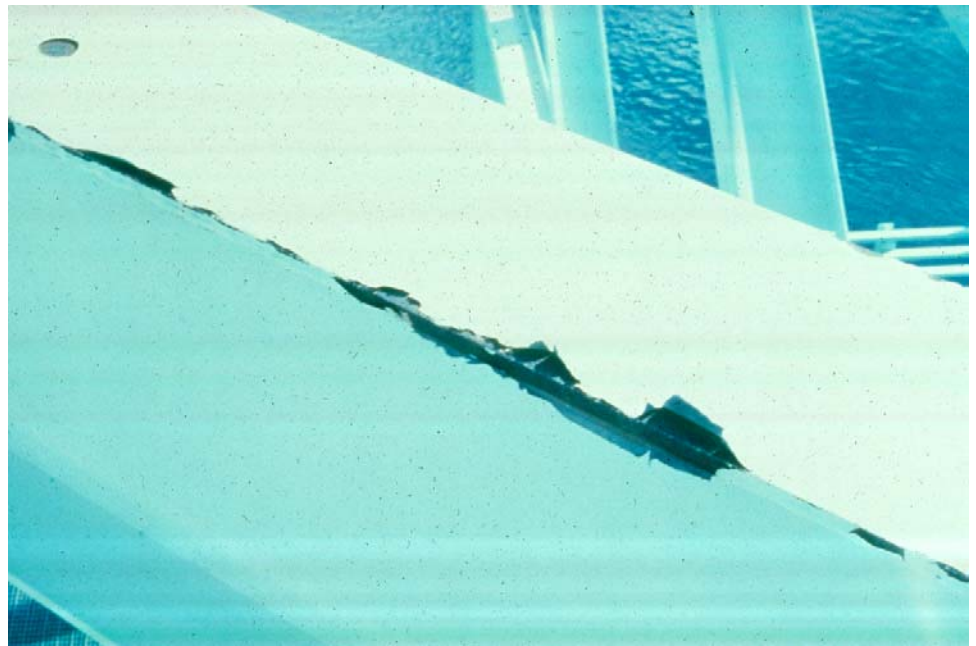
Edge Failure on Painted Steel Beam
